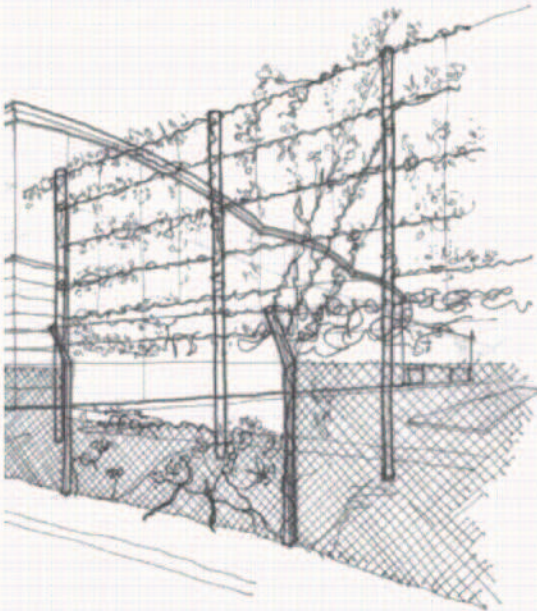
indicative potential green screening that could be incorporated on southern elevation
